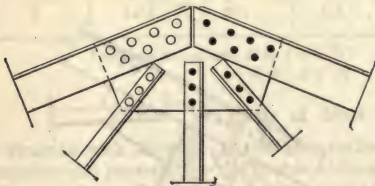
Detail of Joint G, Fink Truss, Fig. 7
